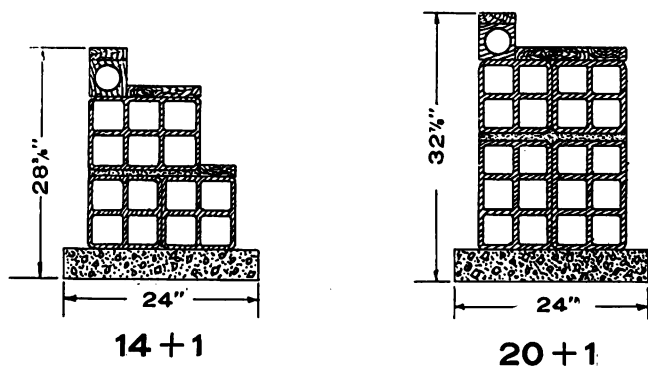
Standard cross-sections of terra-cotta multiple duct.
